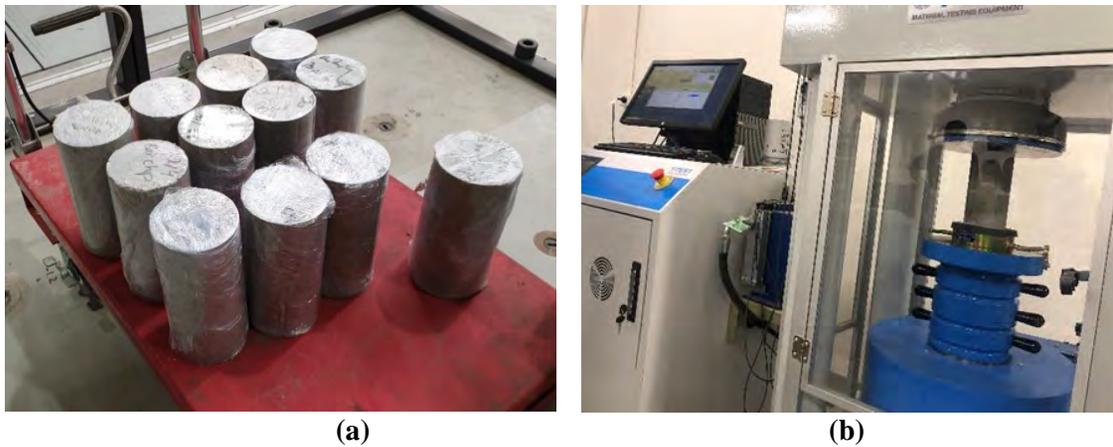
Concrete compression cylinder tests; a) Samples taken from the fresh concrete mix, b) Concrete compression test in process at UTS Tech Lab
